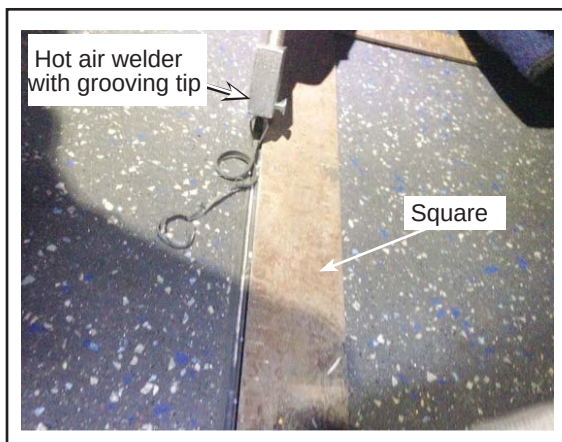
Removal of Damaged Weld Bead with a Grooving Tip Installed on a Hot Air Welder
